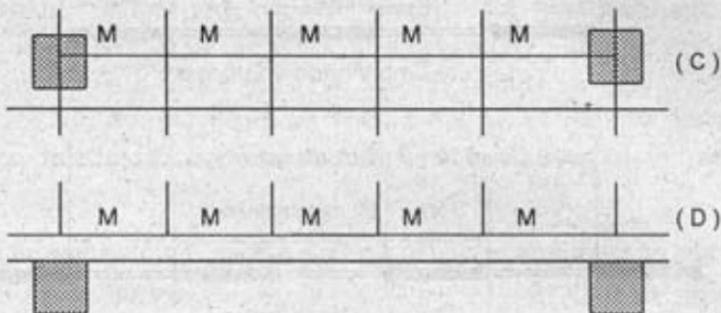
PLANNING MODULE WITH WALL AND COLUMN SPACING
